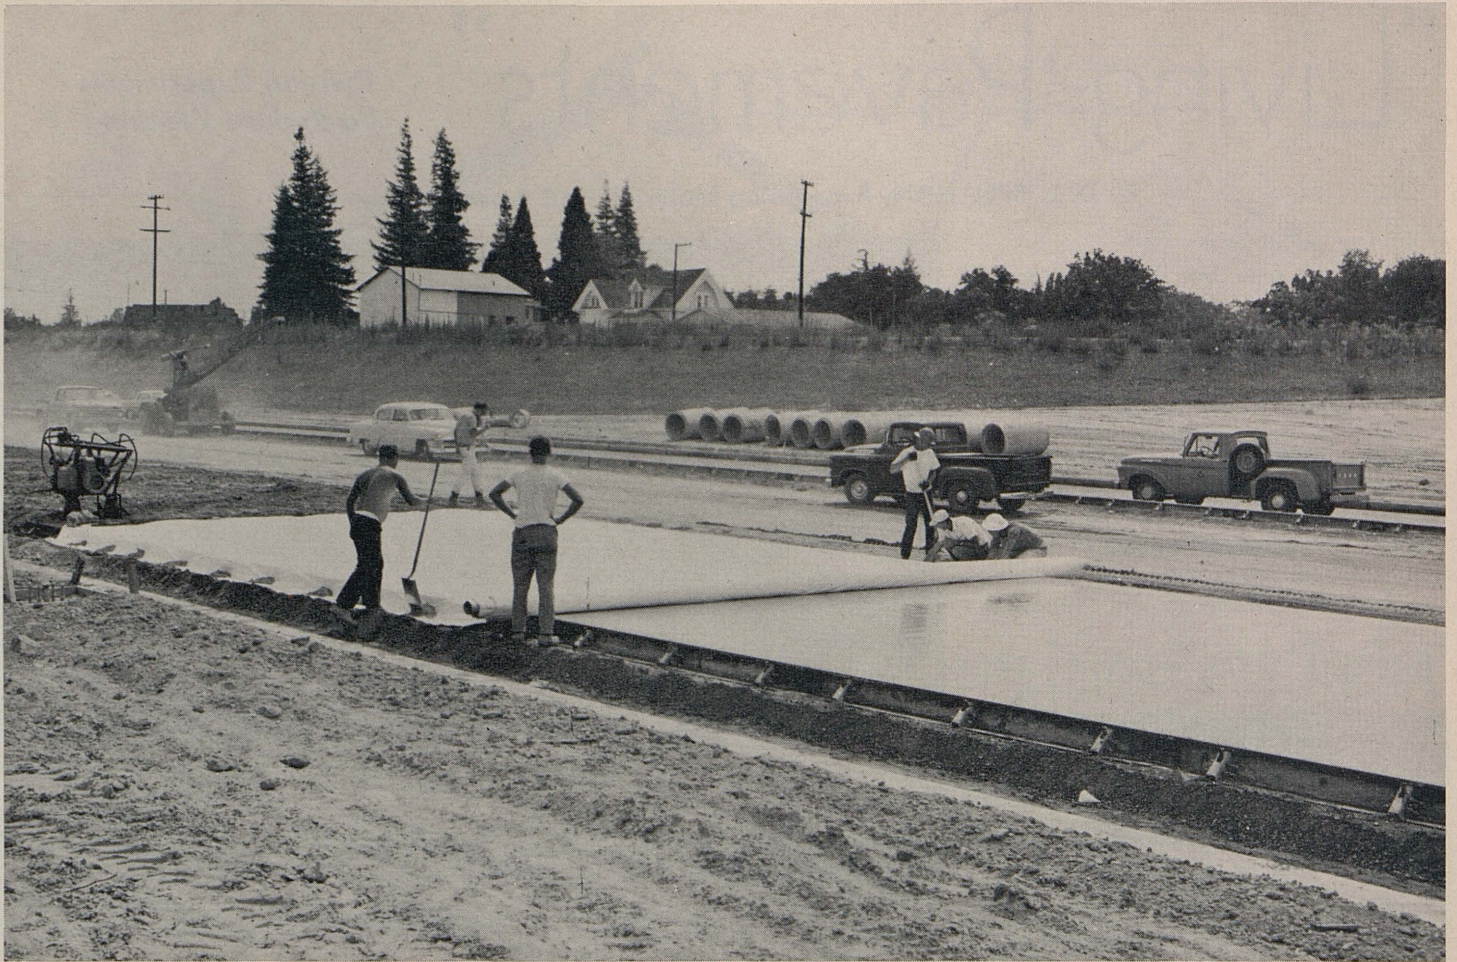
White polyethylene plastic sheeting shown being rolled into place over previously wet pavement for purposes of curing the expanding cement section.
